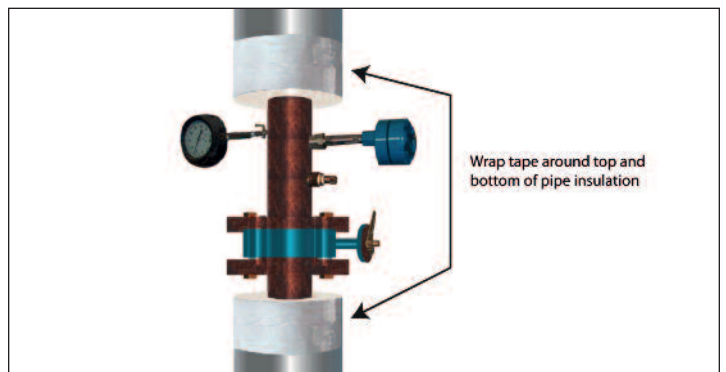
Tape top and bottom surfaces with a single row of tape.
